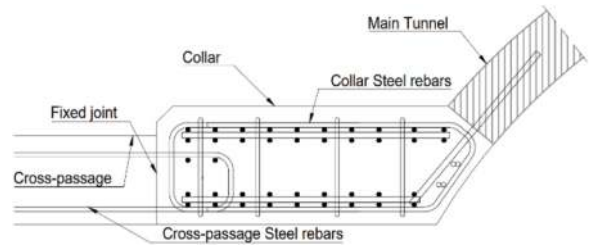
Example of fixed joint between the collar and the Cross Passage Section.
